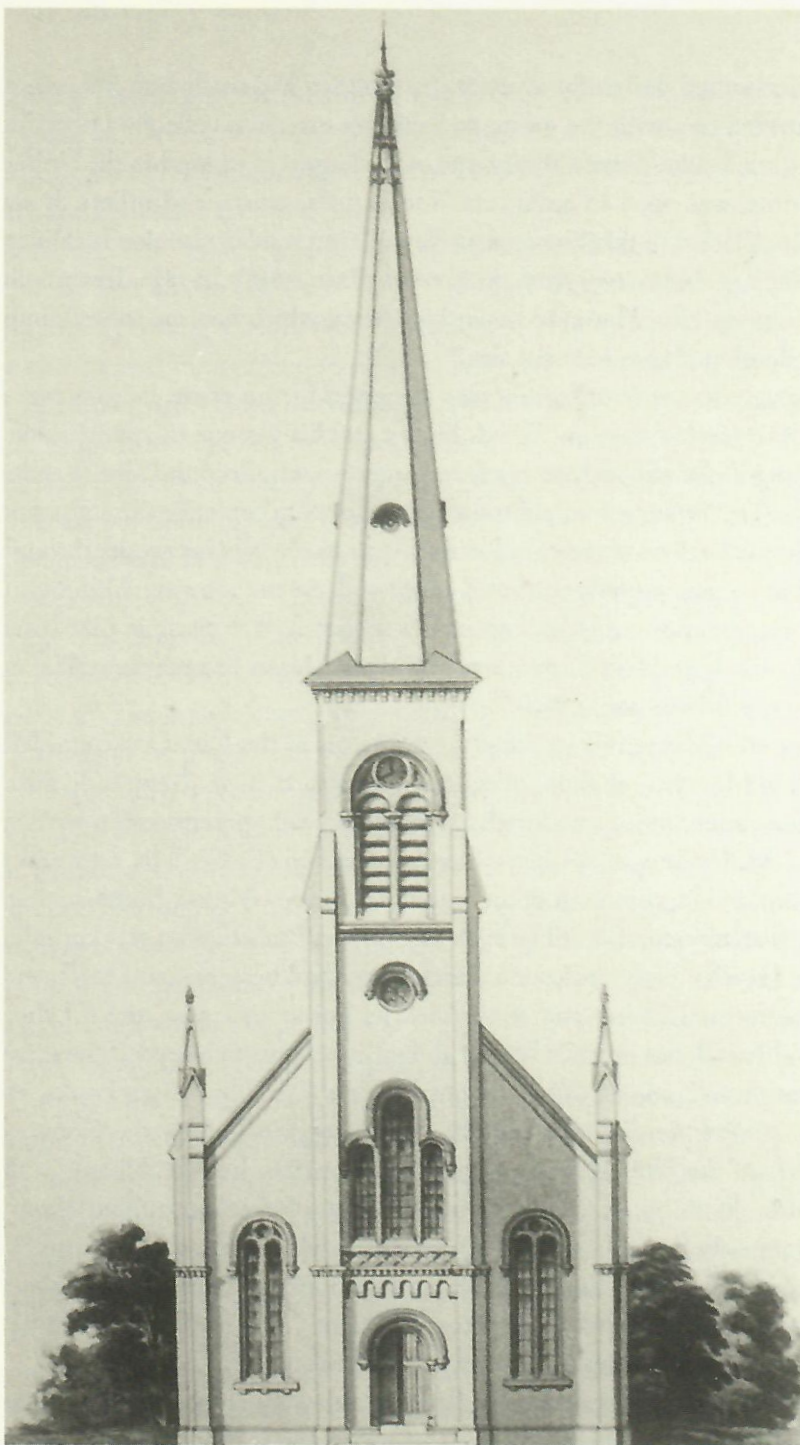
Sidney Mason Stone, church facade. Plate 5 from Mix's copy of *Rural Church and Cottage Architecture*, n.d. Photo by the author. Courtesy of the Milwaukee Public Library.
